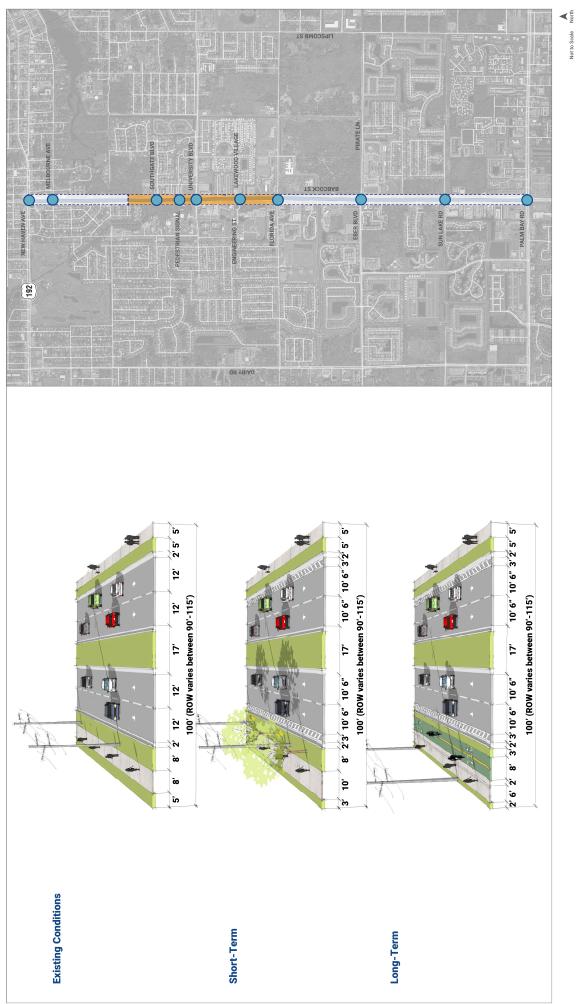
| Florida Avenue to Crane Creek Bridge Typical Section
